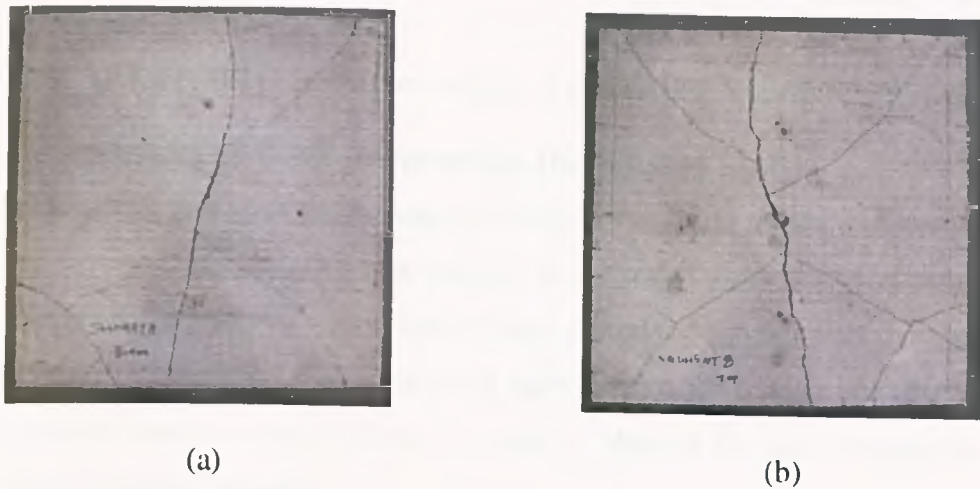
Test 7 (a) View of bottom surface of slab and (b) View of top surface of slab.
